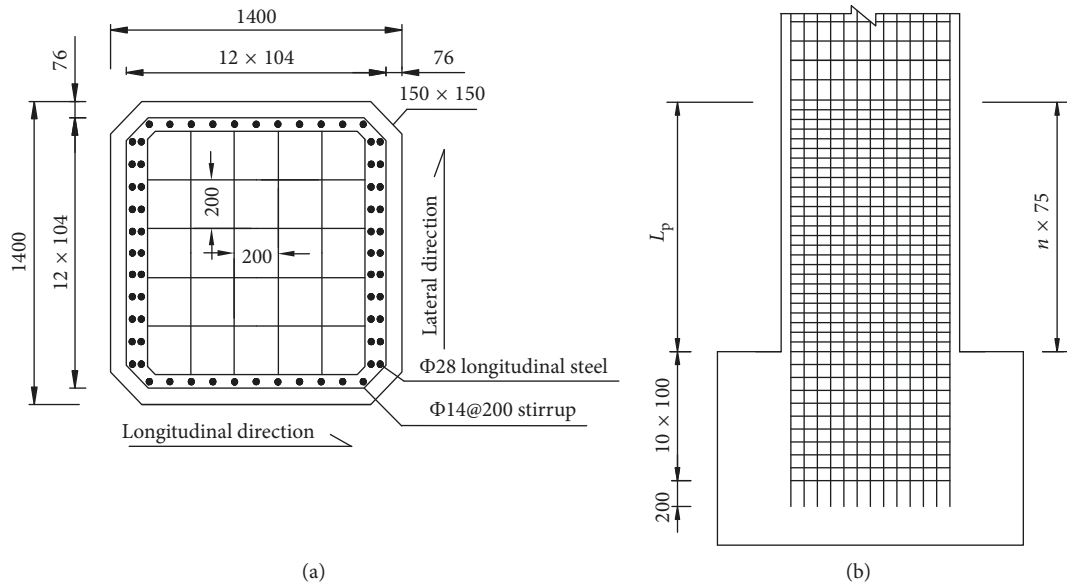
Arrangement of steel bars in bridge columns (unit: mm). (a) Arrangement of steel bars in the section. (b) Arrangement of steel bars in the mesh area with length  $L_p$ .
